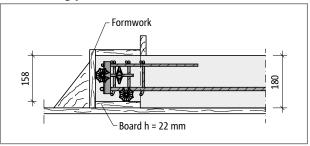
Schöck Tronsole® type Z: Production of a corbel bracket on the fully precast landing; landing slab thickness h = 180 mm
